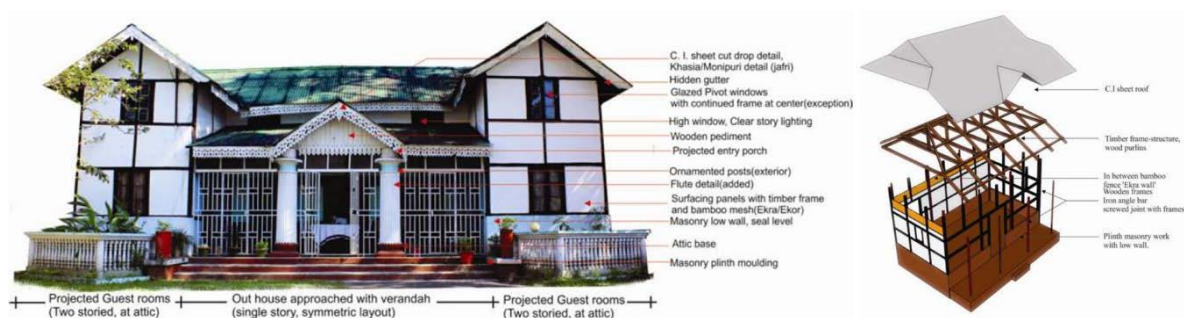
A typical elevation and structural system of Assam style houses (Saha et al .2019)
